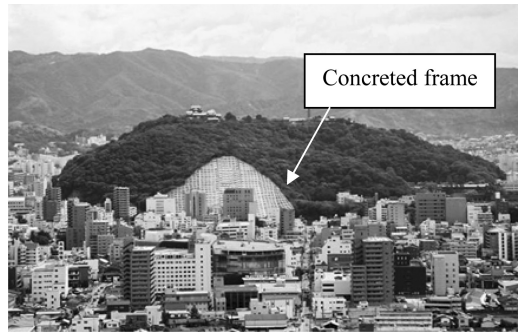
Concrete frame method used in Ma-tsu-yama castle (CG).
